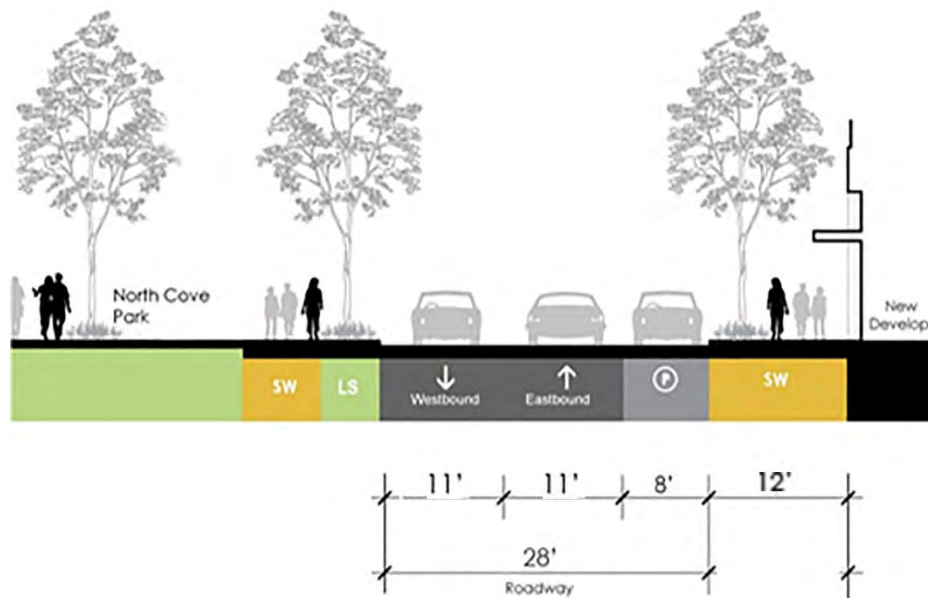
Retail Street Illustration (18th St NE View Looking East to Main Street)
